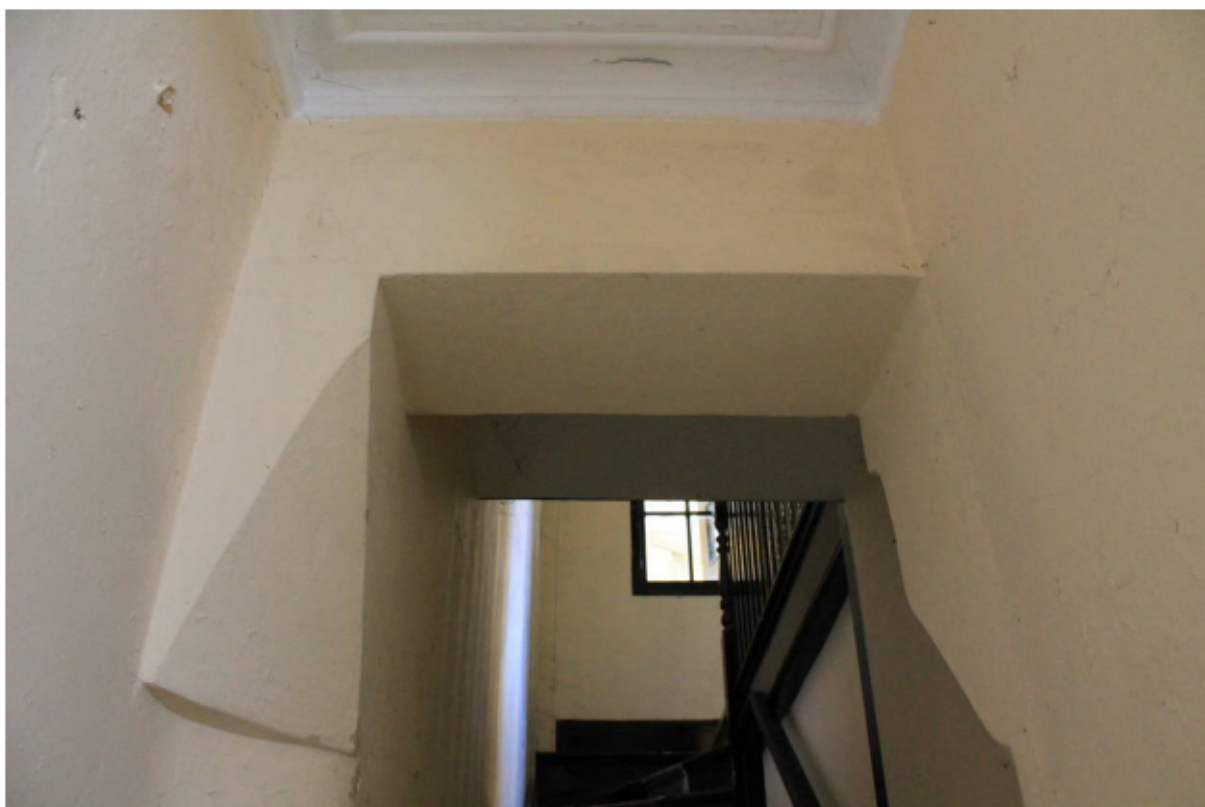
Constrained stopped and chamfered opening to stair G5, looking east
